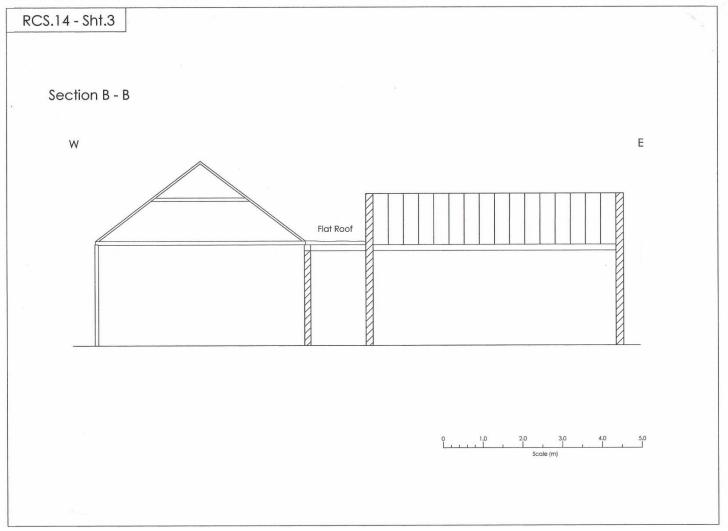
Rosehill Country Store: Section through south end of building (See Fig. 4 for location)
